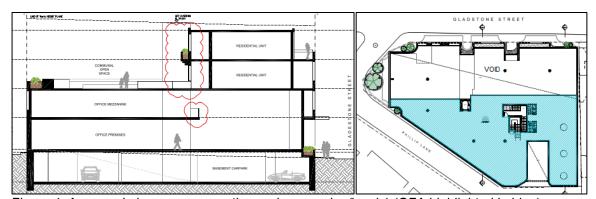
Approved plans – cross section and mezzanine/level 1 (GFA highlighted in blue)
